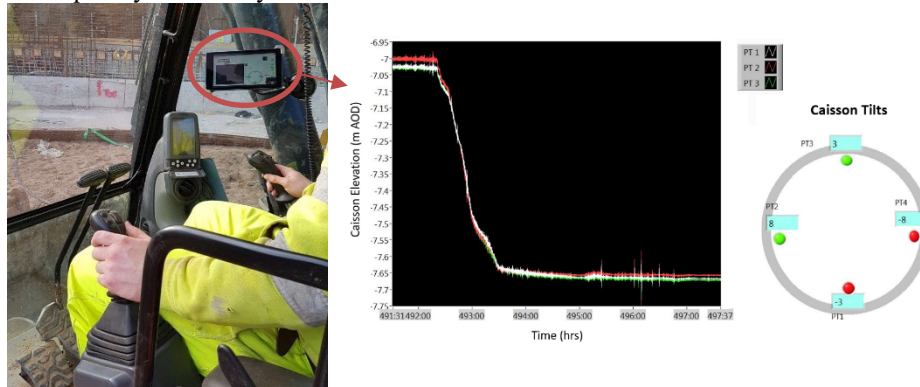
Feed-back of caisson elevations via tablet in excavator
